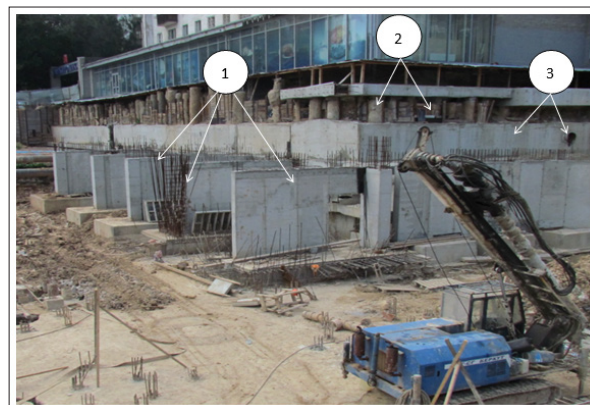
Geotechnical works at node "1" to strengthen the deformed existing retaining wall of the construction pit enclosure: 1-monolithic reinforced concrete buttresses; 2-existing pit enclosure made of bored piles; 3-finished pit enclosure made of monolithic reinforced concrete.
